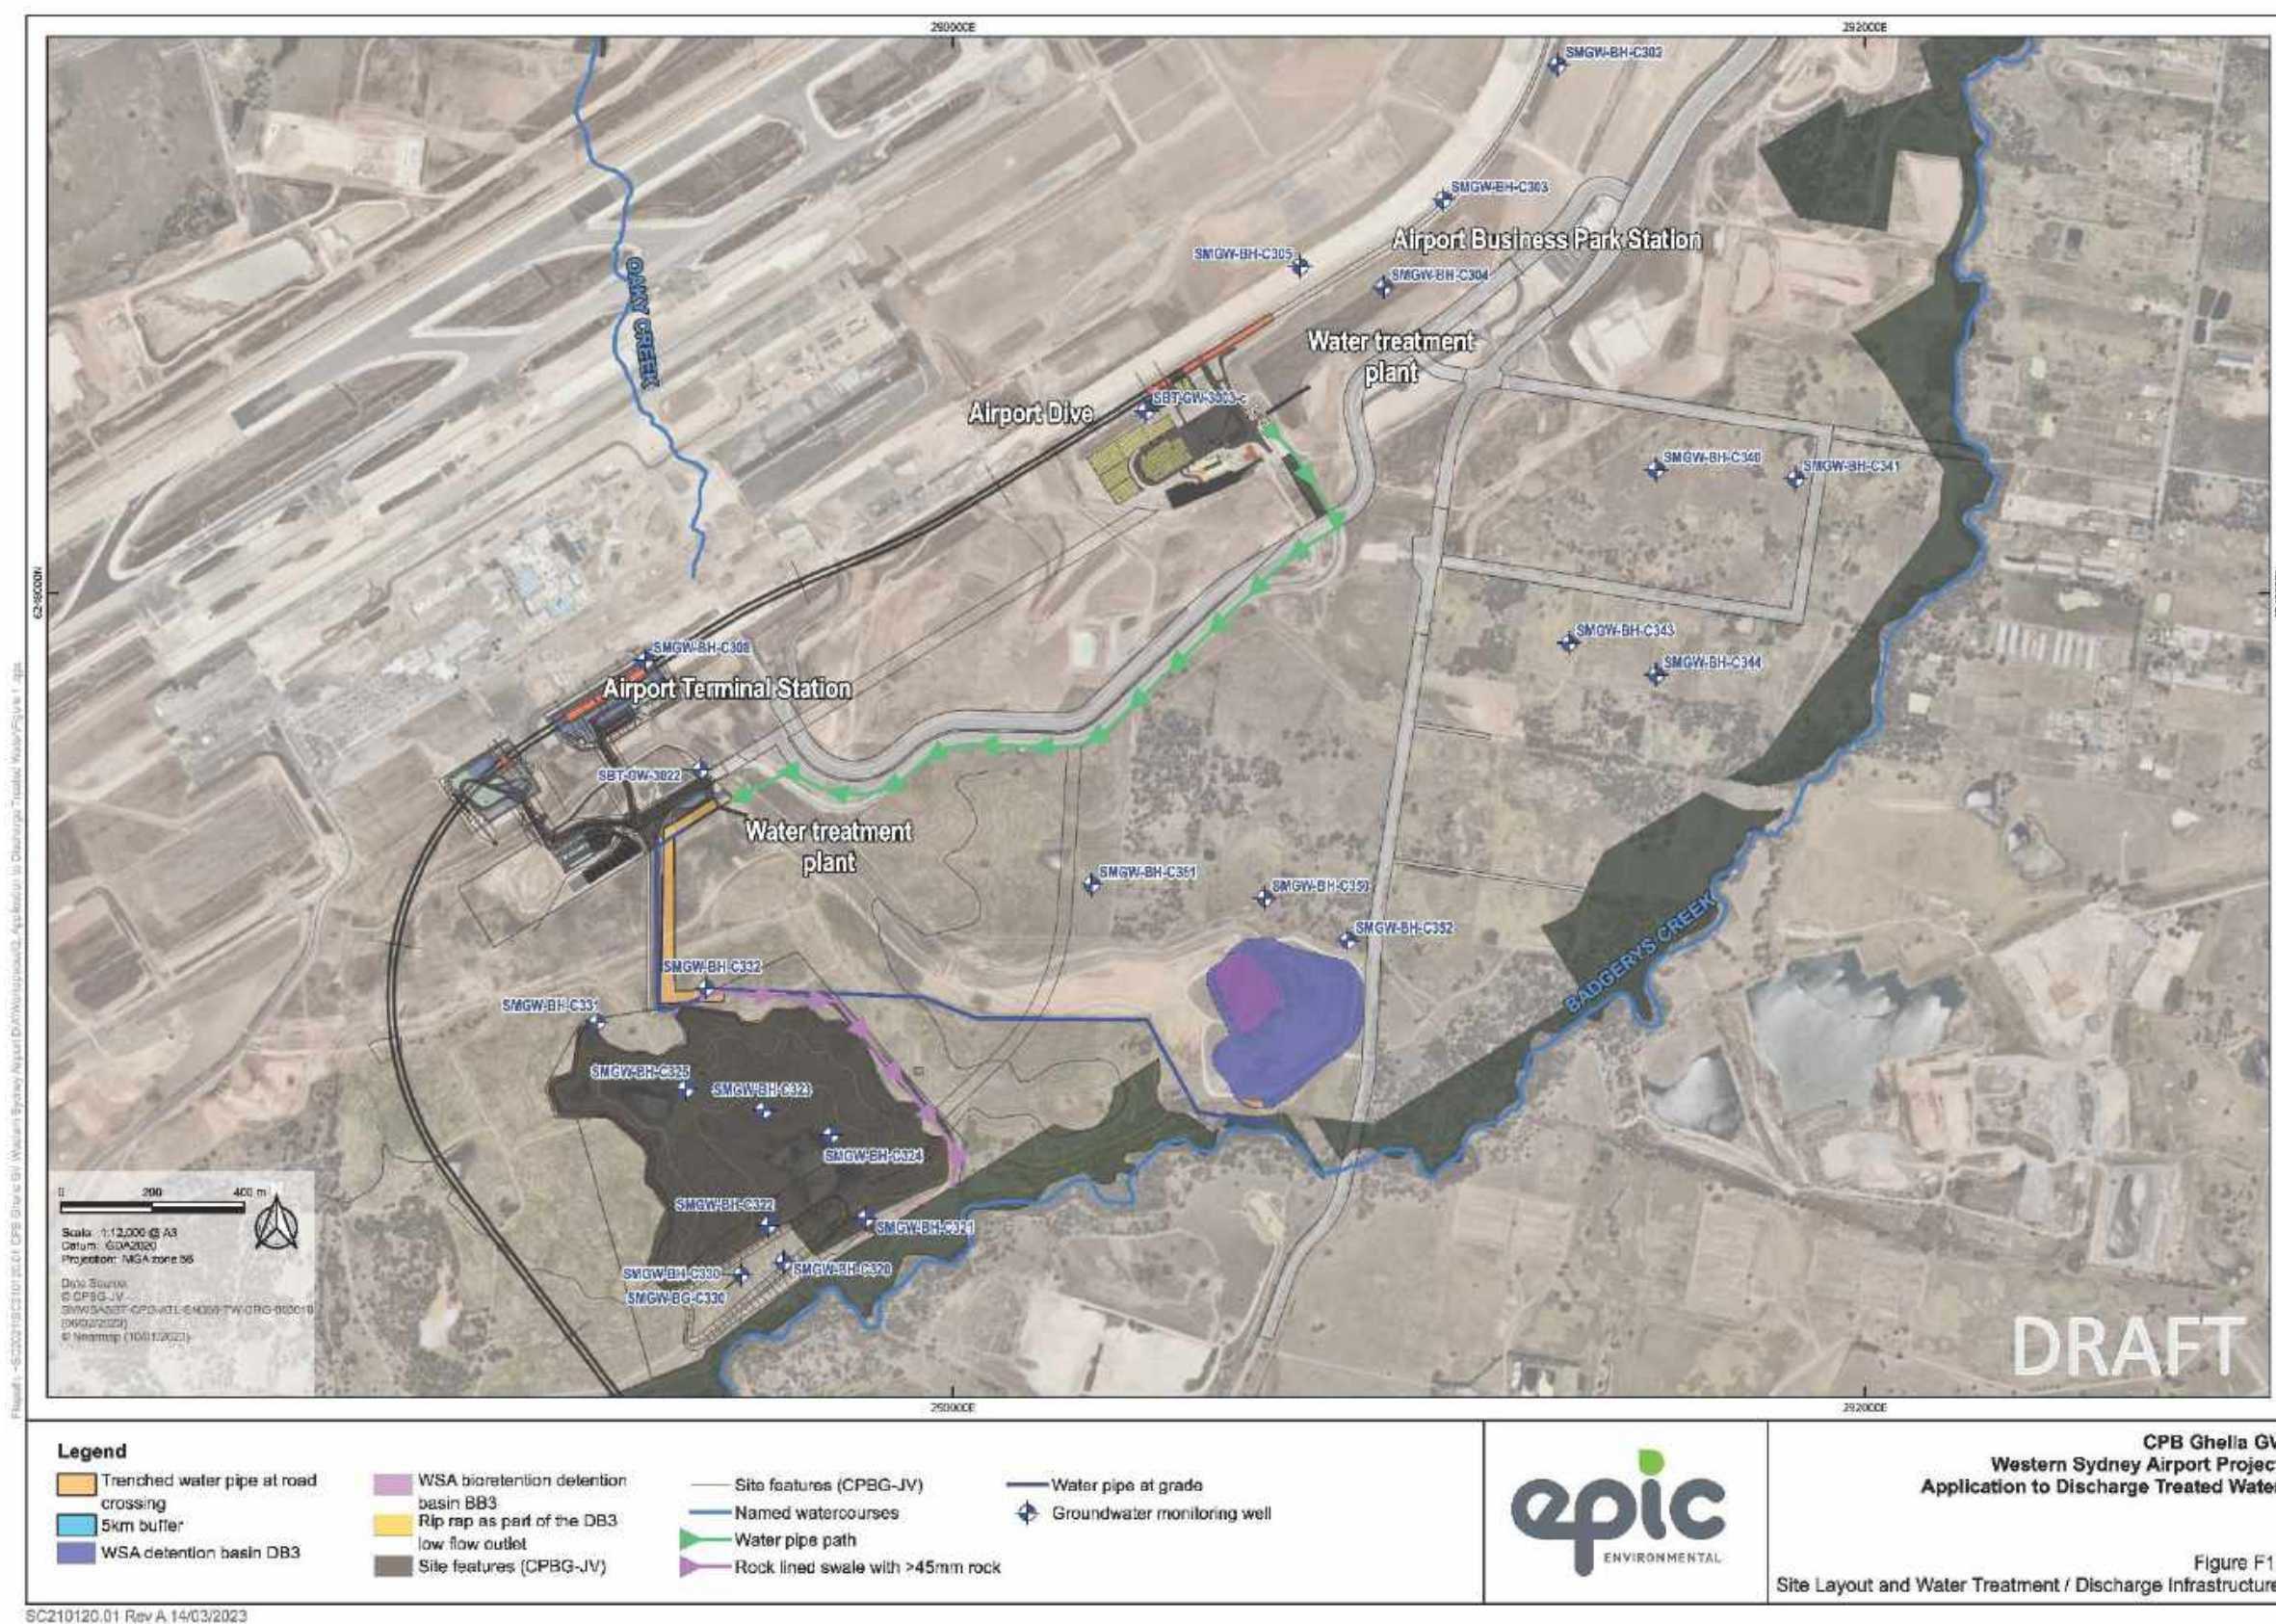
On-Airport Site Layout, Water Treatment Plants, and Discharge Infrastructure
